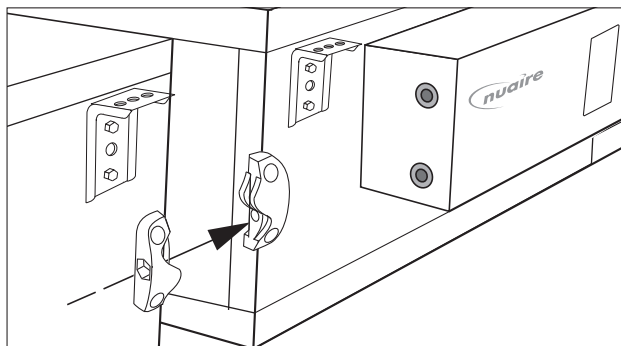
Once located, tighten bolts ensuring seal between silencer and seal is achieved.
